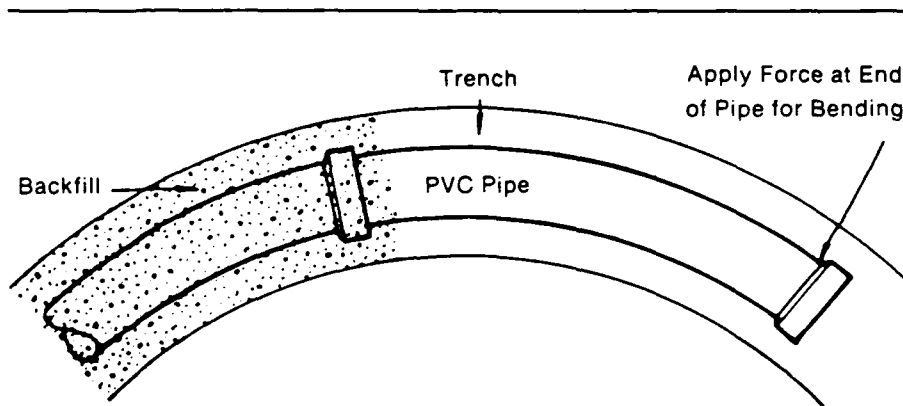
Allowable Minimum Radii for Bending PVC Pipe. (From Innovative Site Utility Installations, HUD.)
